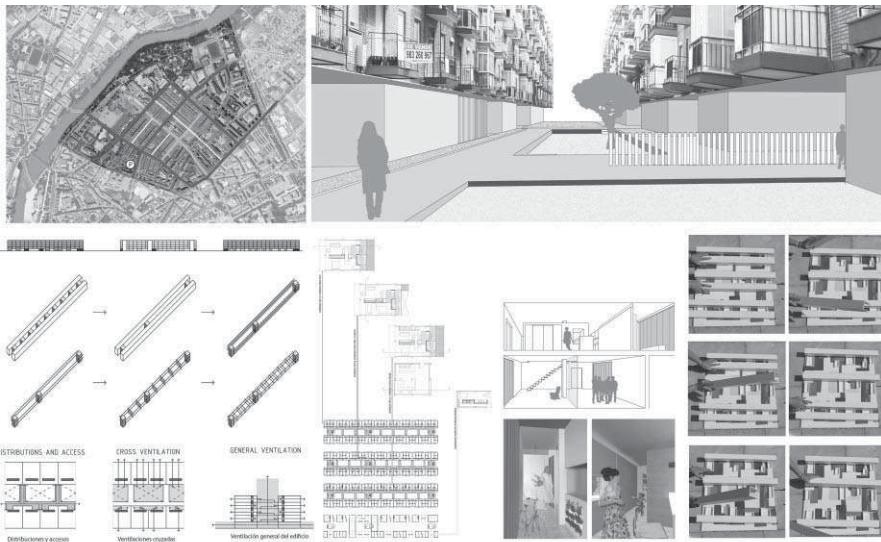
Site plan. View of the encounter space. Plans, sections, interior views. Ground floor tapestry.
